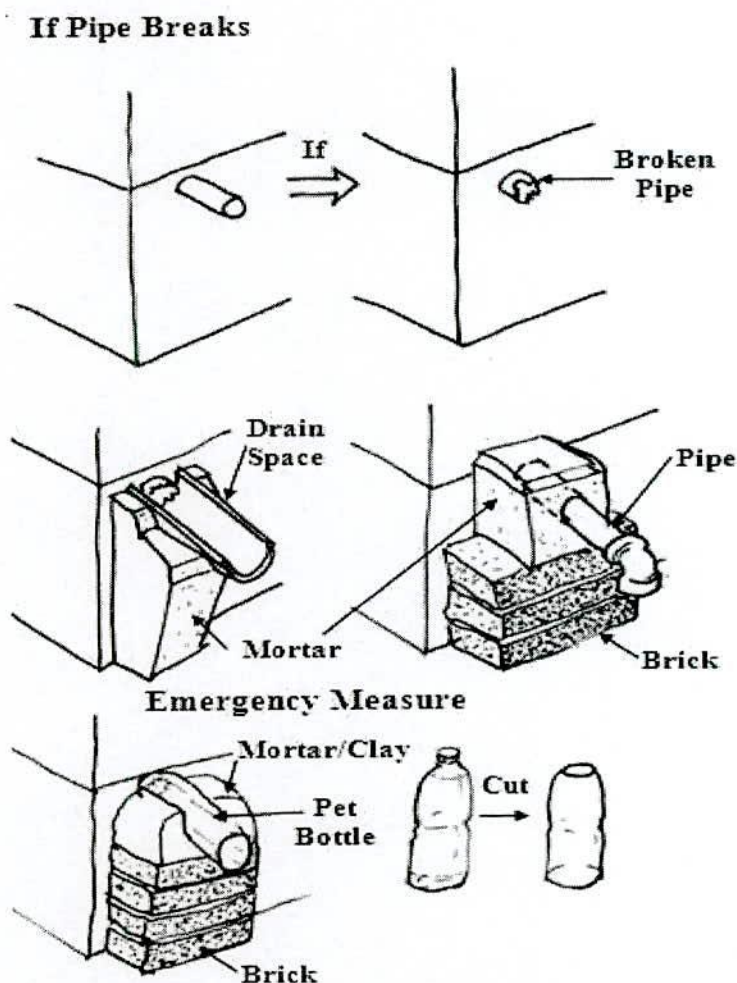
Repairing of pipes outside the EcoSan toilet (Source: JADE, 2011)
